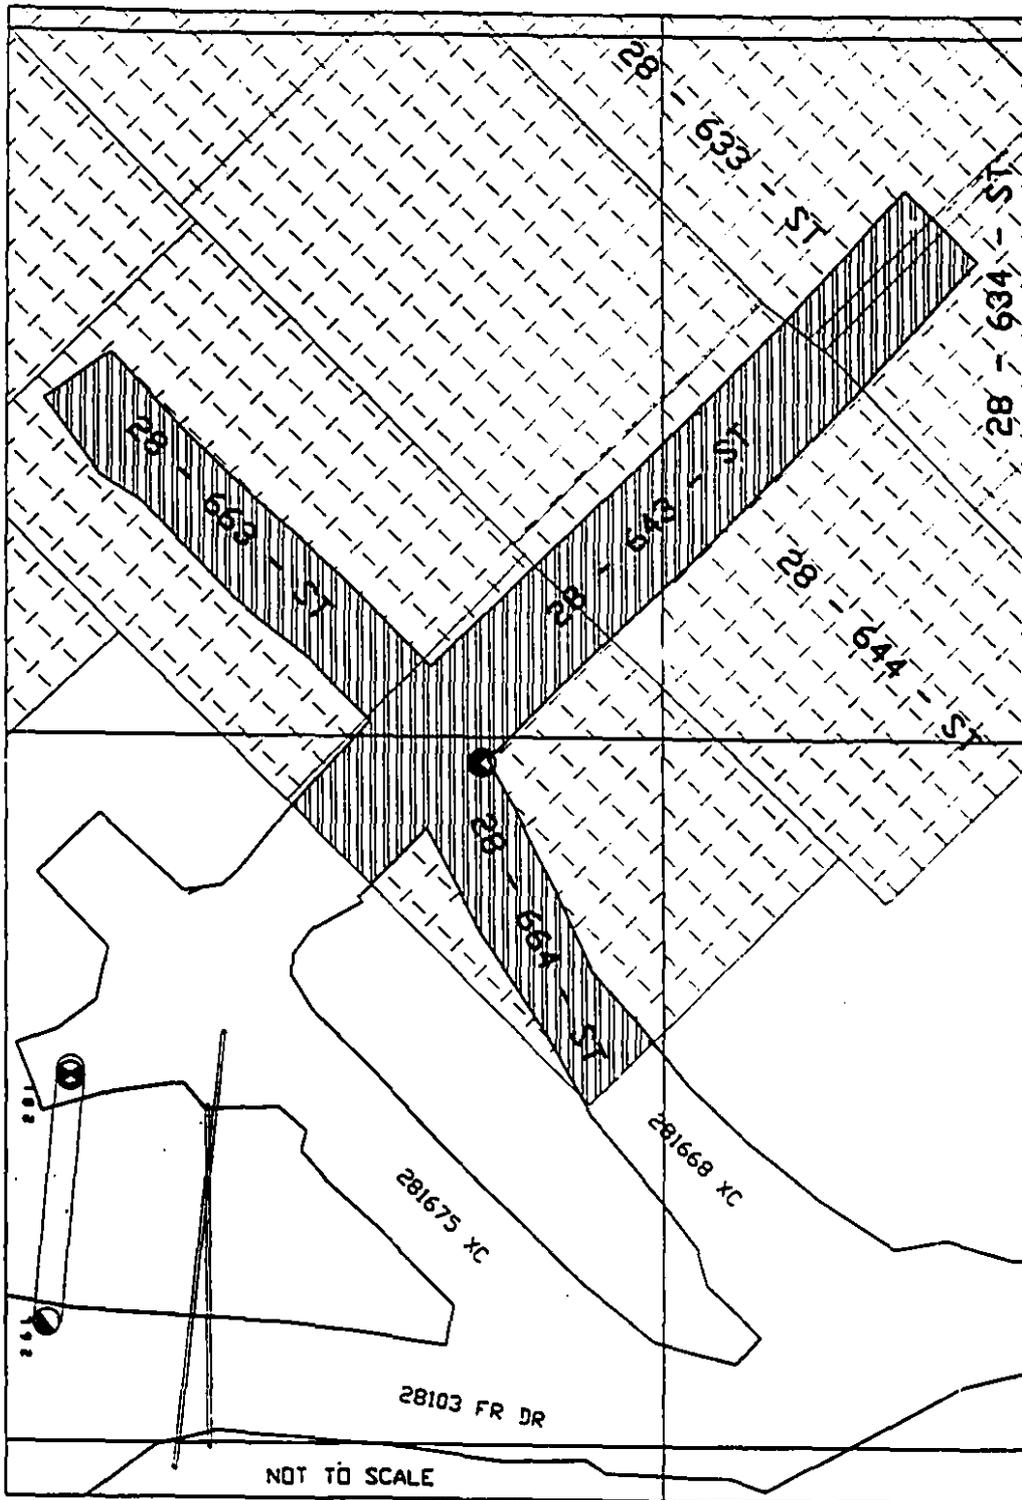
LEVEL PLAN SHOWING 28-663, 28-643 AND 28-644 ROADHEADER DRIFTS (TRUCK FILLED)
